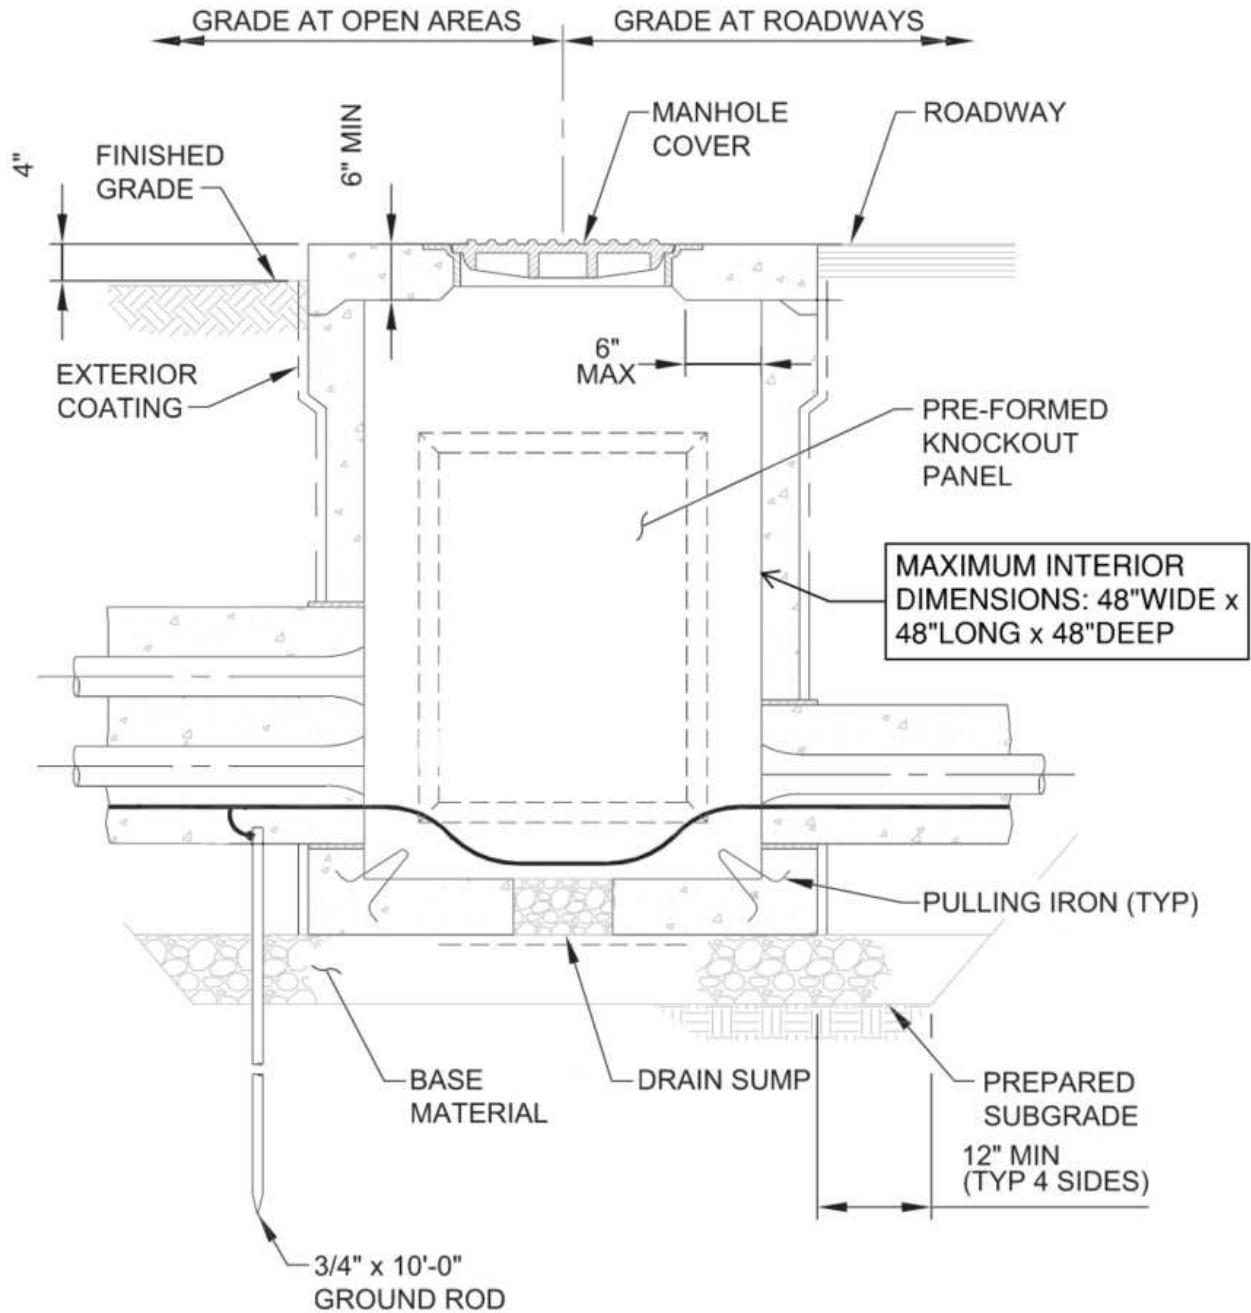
Precast Electrical Handhole with Manhole Cover Detail
